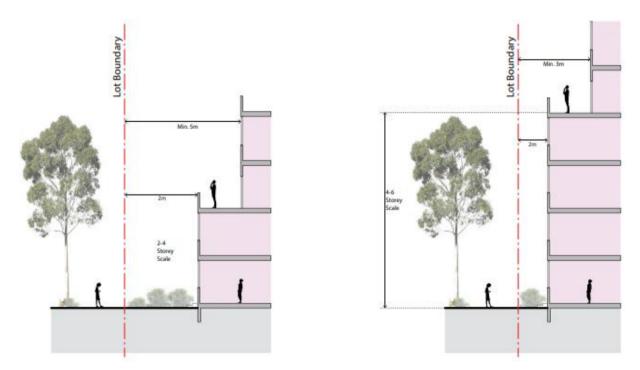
| Setbacks for residential uses along neighbourhood roads (left) and Mawson Avenue south of Balmoral Road and roads south of Byles Place (right) (Source: Applicant's RtS)
